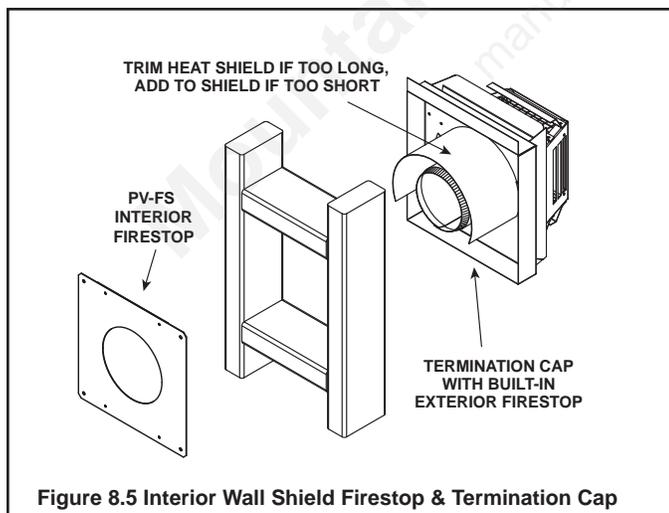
Interior Wall Shield Firestop & Termination Cap
